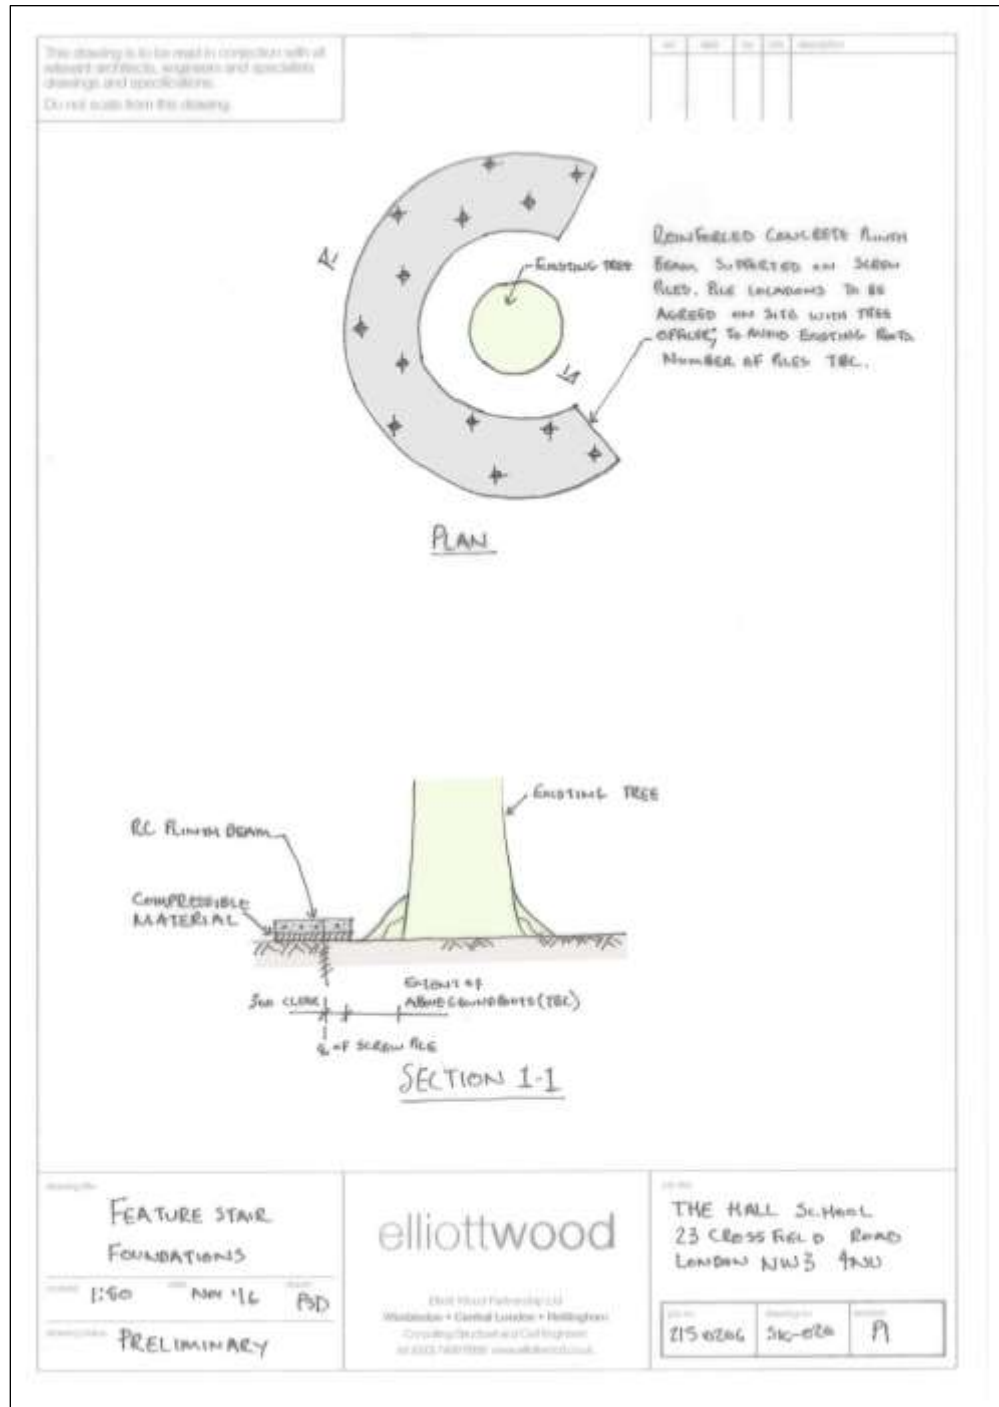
Sketch provided by Elliottwood showing the proposed concrete base location and installation method
